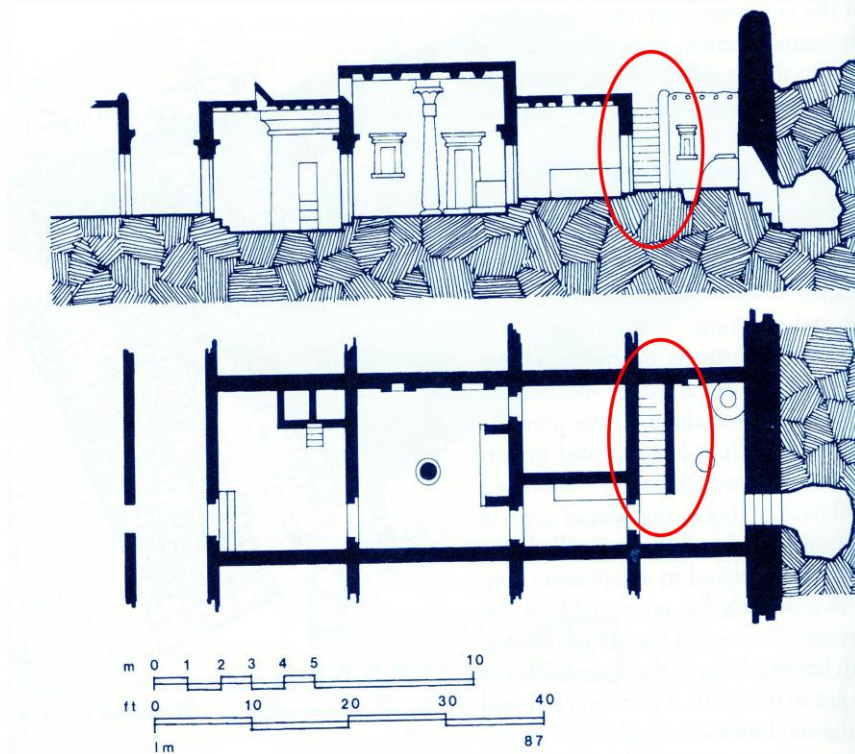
Plan and section of a house in Deir El-Medinah (Roth 2007)
